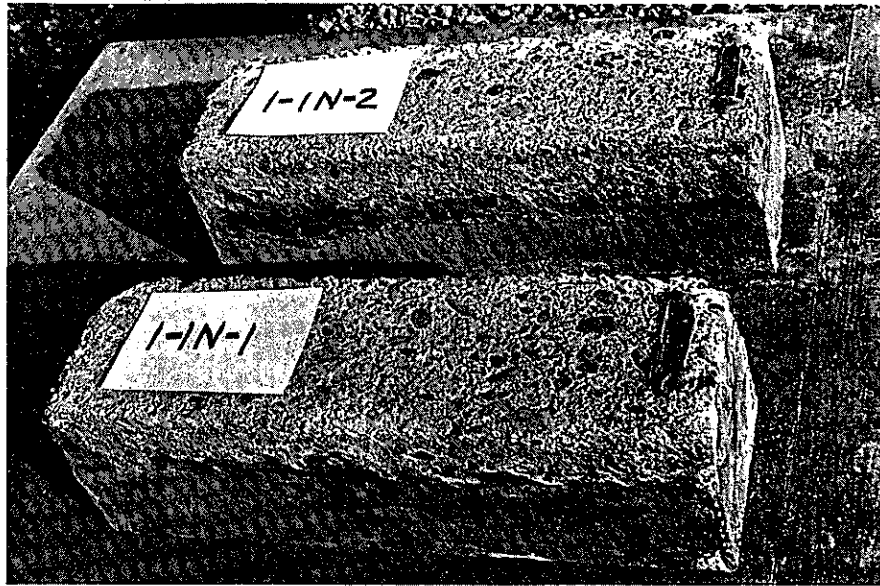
Internally restrained concrete beams made with shrinkage compensated cement no. 1 after 1 yr. sulfate exposure.
